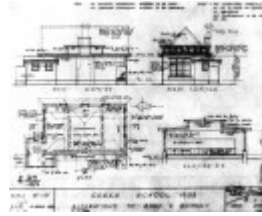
P. Everett, Proposed Alterations to Ceres School ? Floor Plan, Elevations & Section, 10 March 1949, Source: Drawing SSN 1602.2, Public Record Office Victoria.
